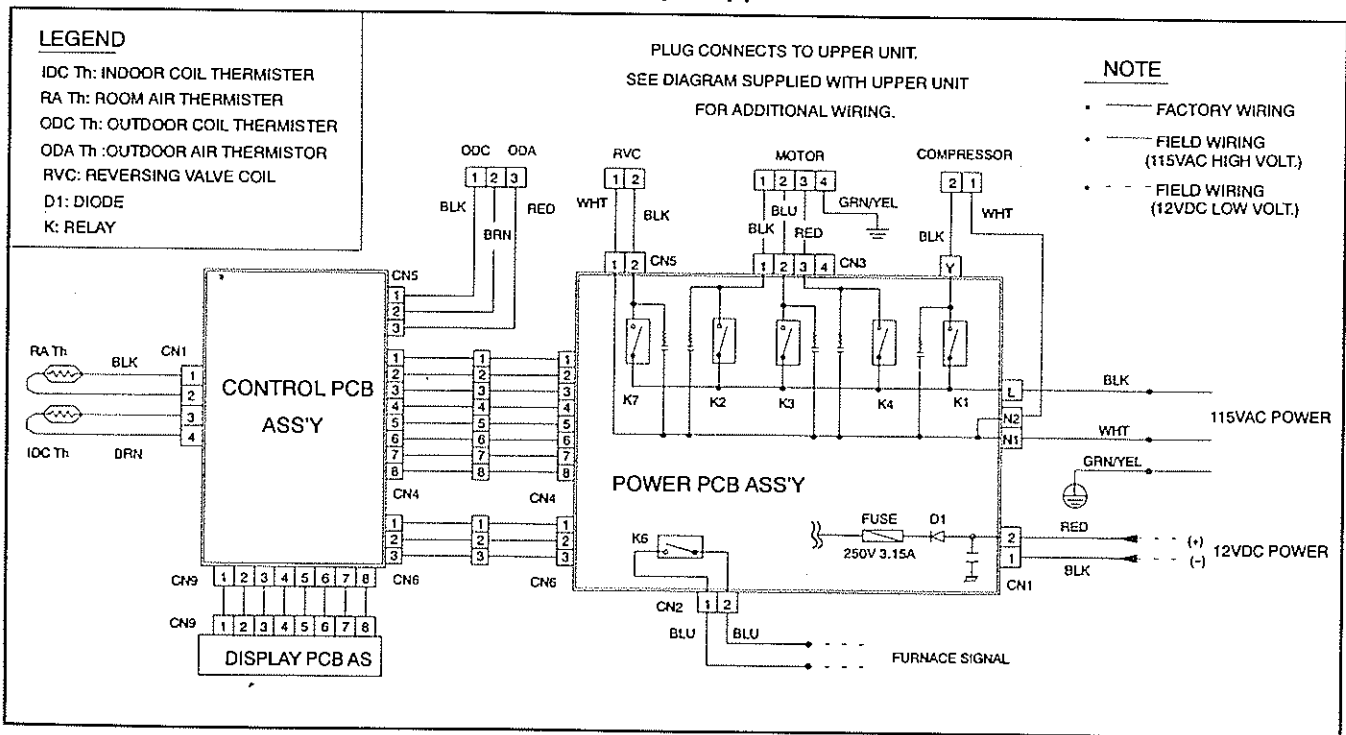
Heat Pump - Ceiling Unit - Ducted
